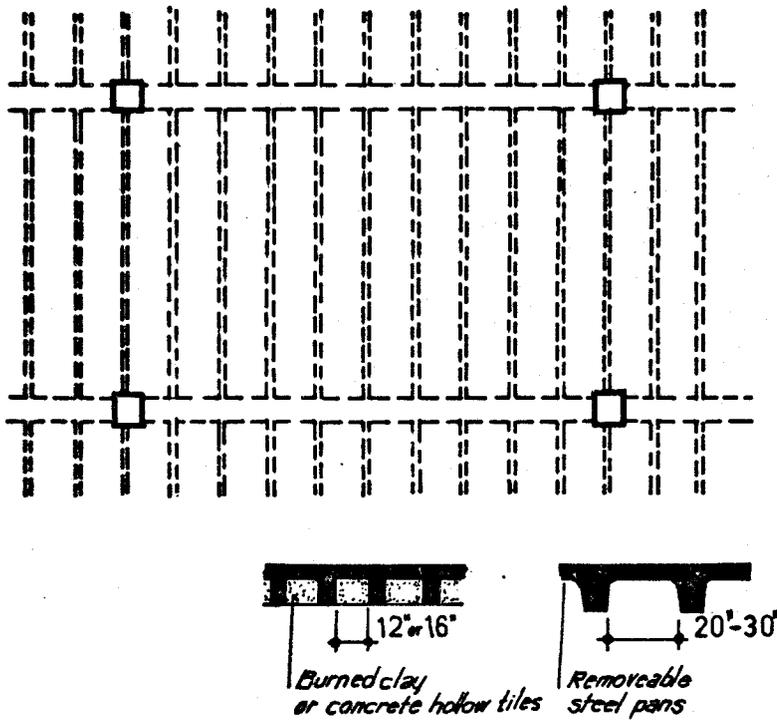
CONCRETE JOIST FLOOR CONSTRUCTION
